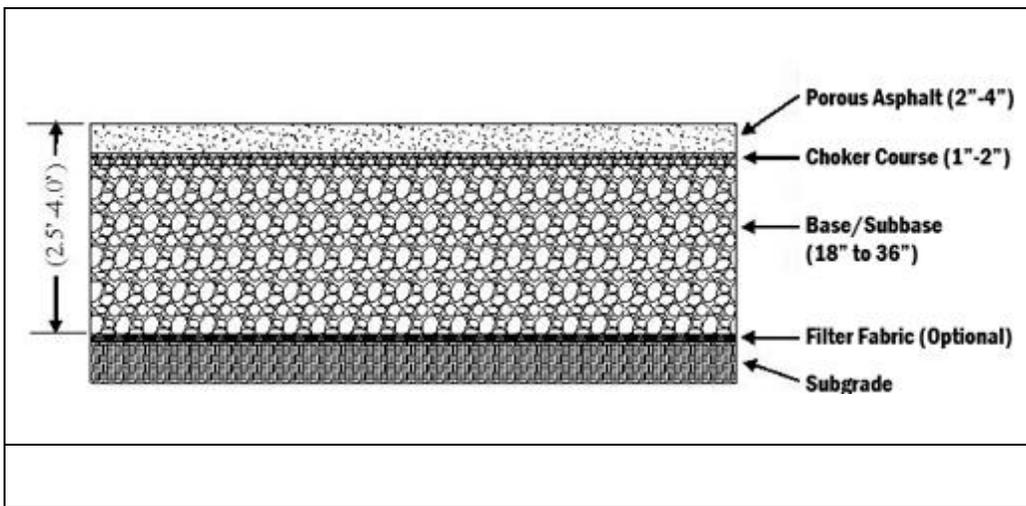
Typical permeable asphalt pavement section (diagram adapted from US EPA)
